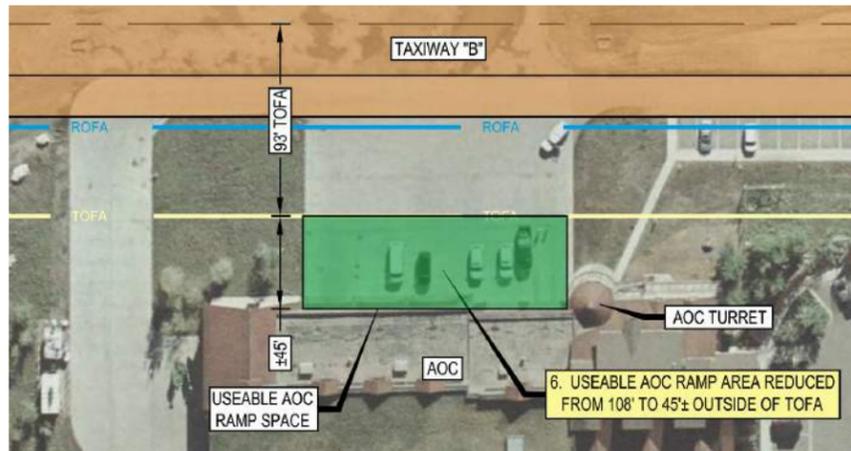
Existing West Side Infrastructure Impacts (Appendix B, Alternative 4, Sheet 1 of 5)
